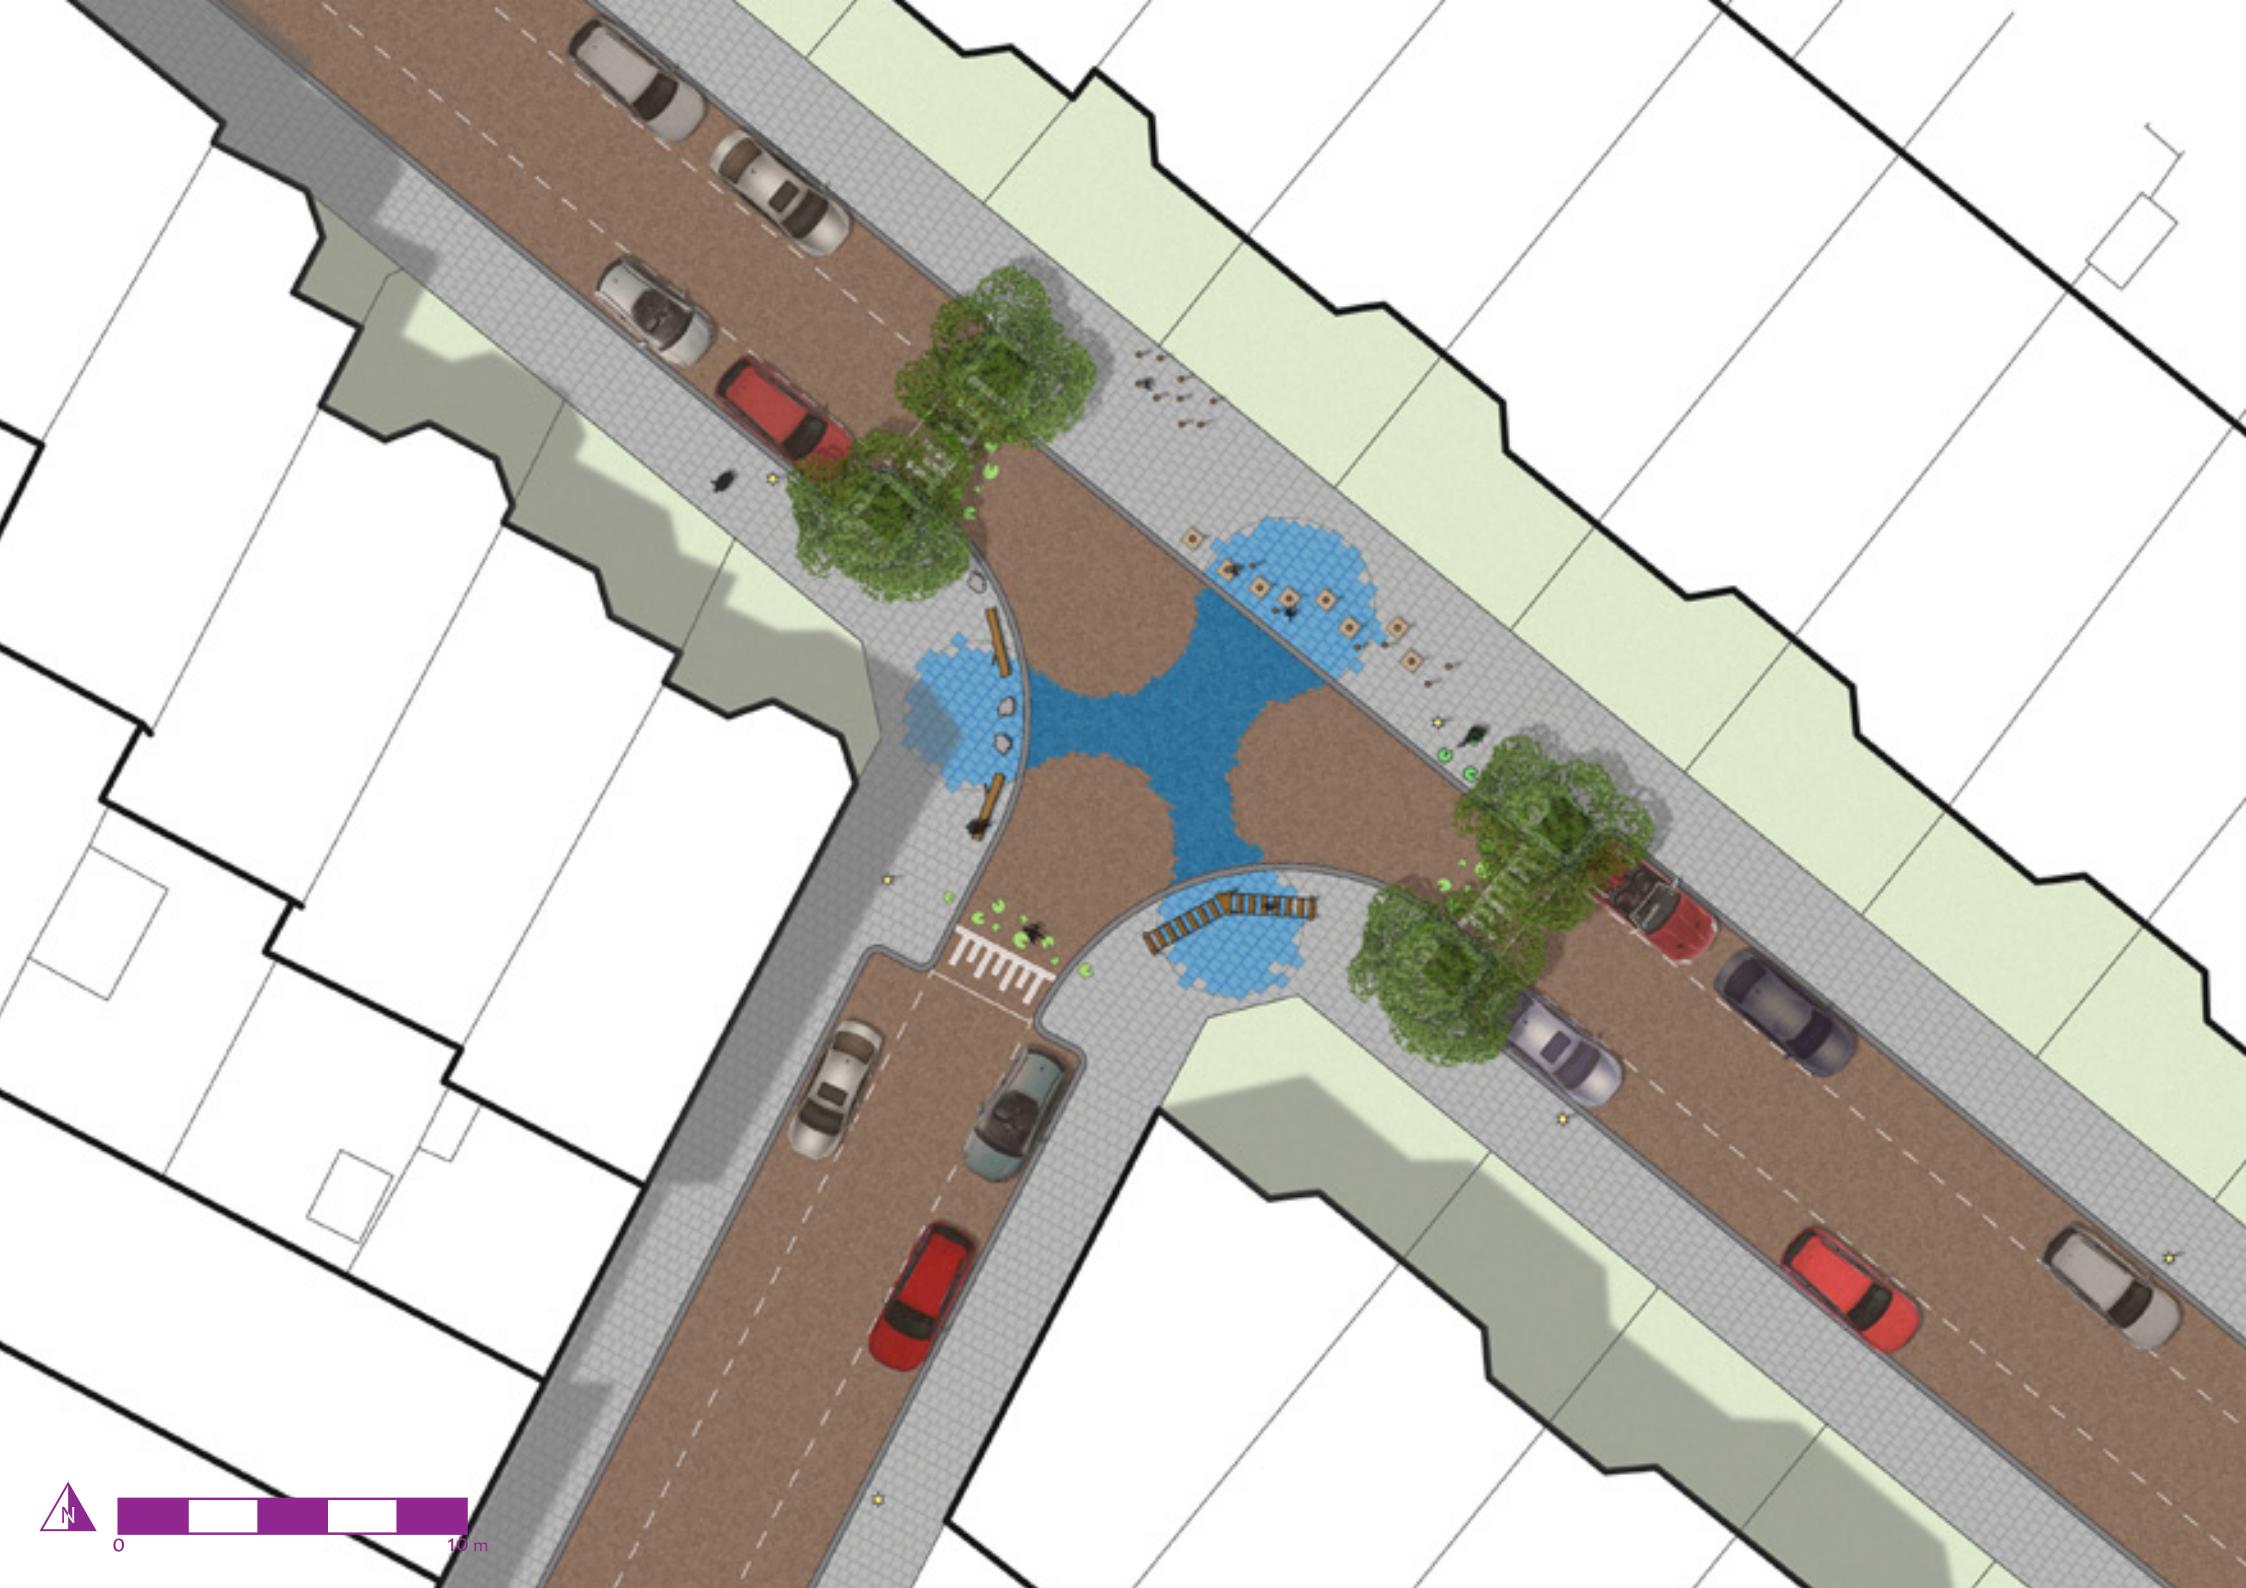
Model 3 - creating separate spaces widening the sidewalks and connecting these with a traffic plateau
